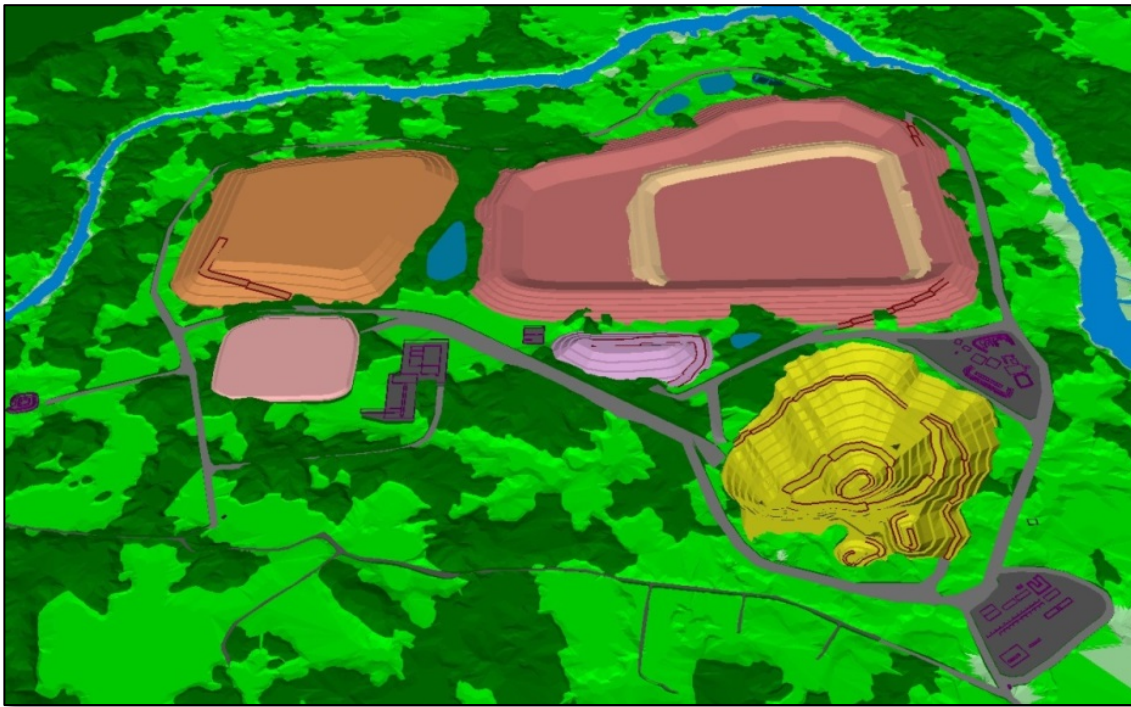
Jugan – Alternate Infrastructure Layout (3D)
